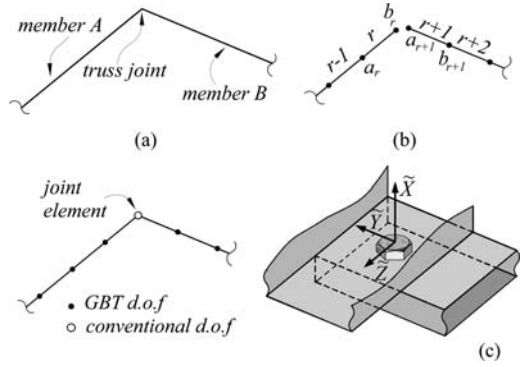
(a) joint element” concept, (b) longitudinal discretisation of the connected members and (c) truss joint view.
